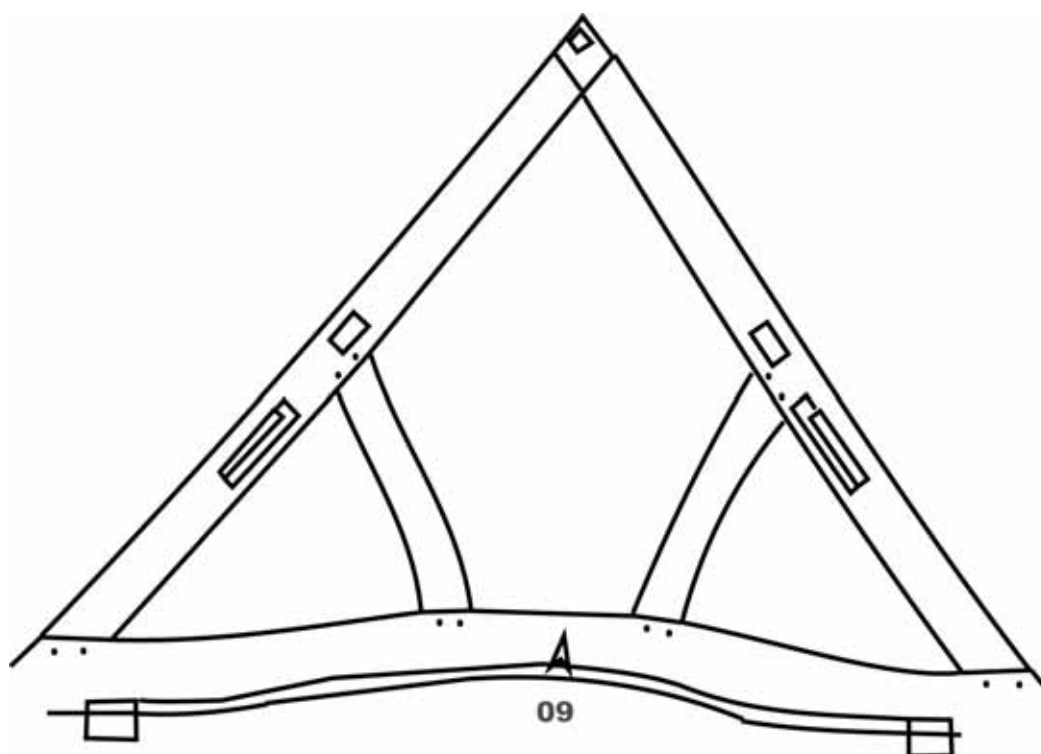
St Mary's Church, truss 7 east face, showing the location of sample SAR-A09
